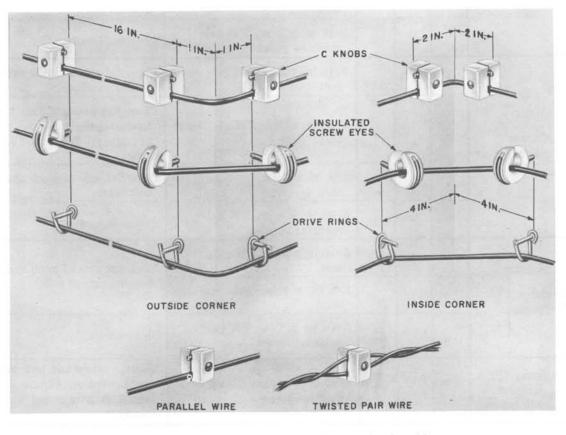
Fastening Drop and Block Wire Inside of Buildings
